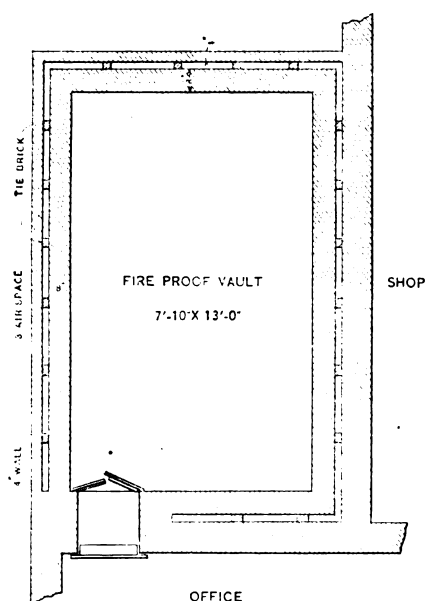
Foundation Plan.—Scale, 3-16 Inch to the Foot.
